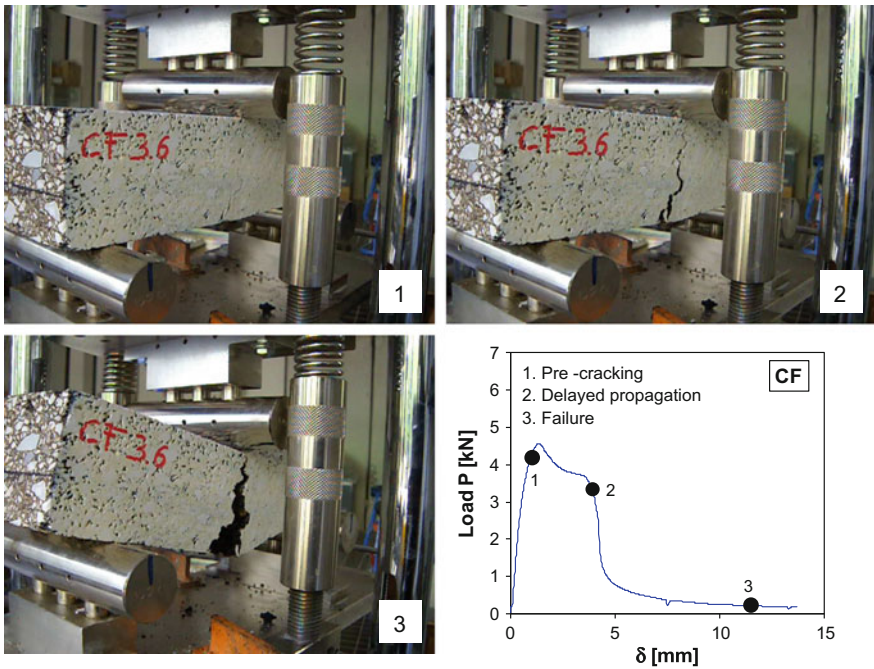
Failure mechanisms of CF reinforced specimens in 3PB test (Canestrari et al. 2015)
